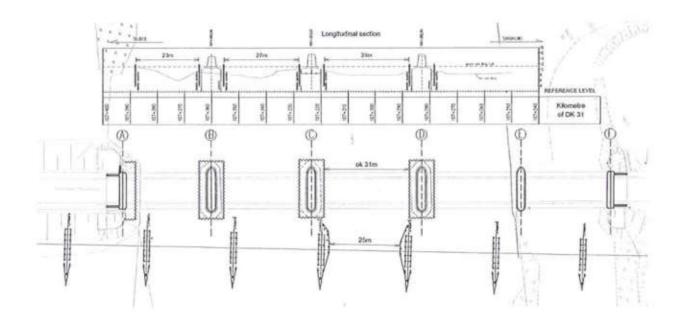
Illustrative drawing of the longitudinal section with sheet piling at existing bridge supports (red) and the location of temporary bridge supports (blue)
